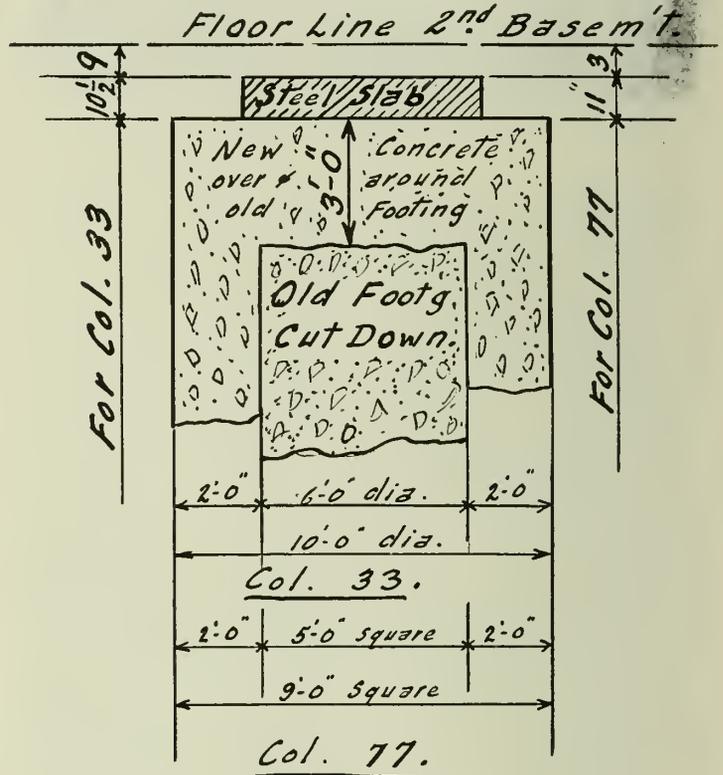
Section showing addition on to Footings Nos. 33 and 77.
